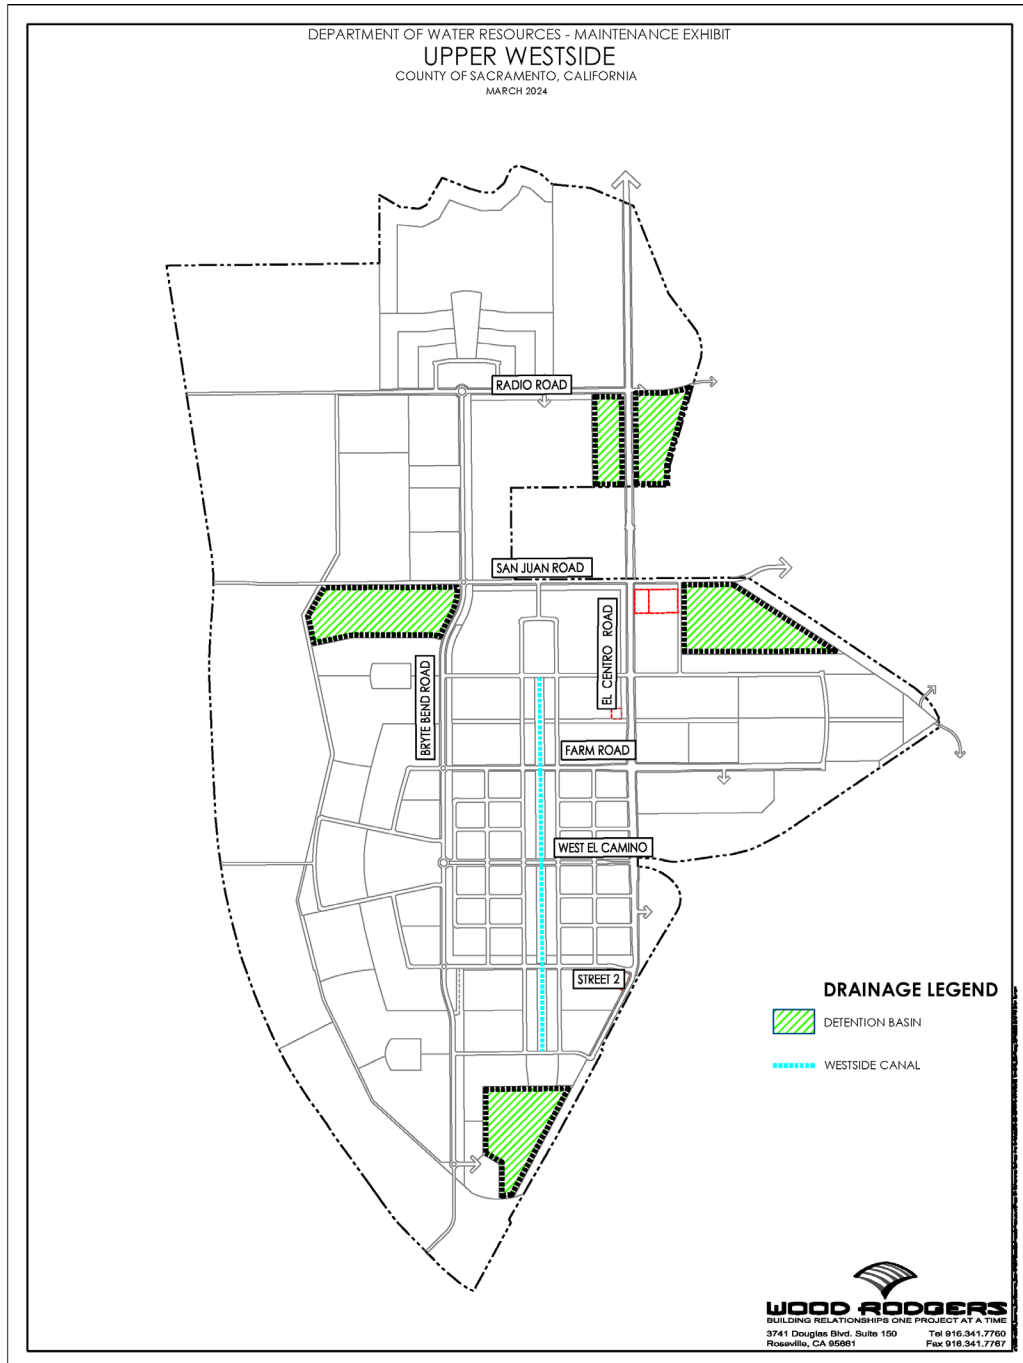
Trunk Drainage Facilities within the UWSP Plan Area
